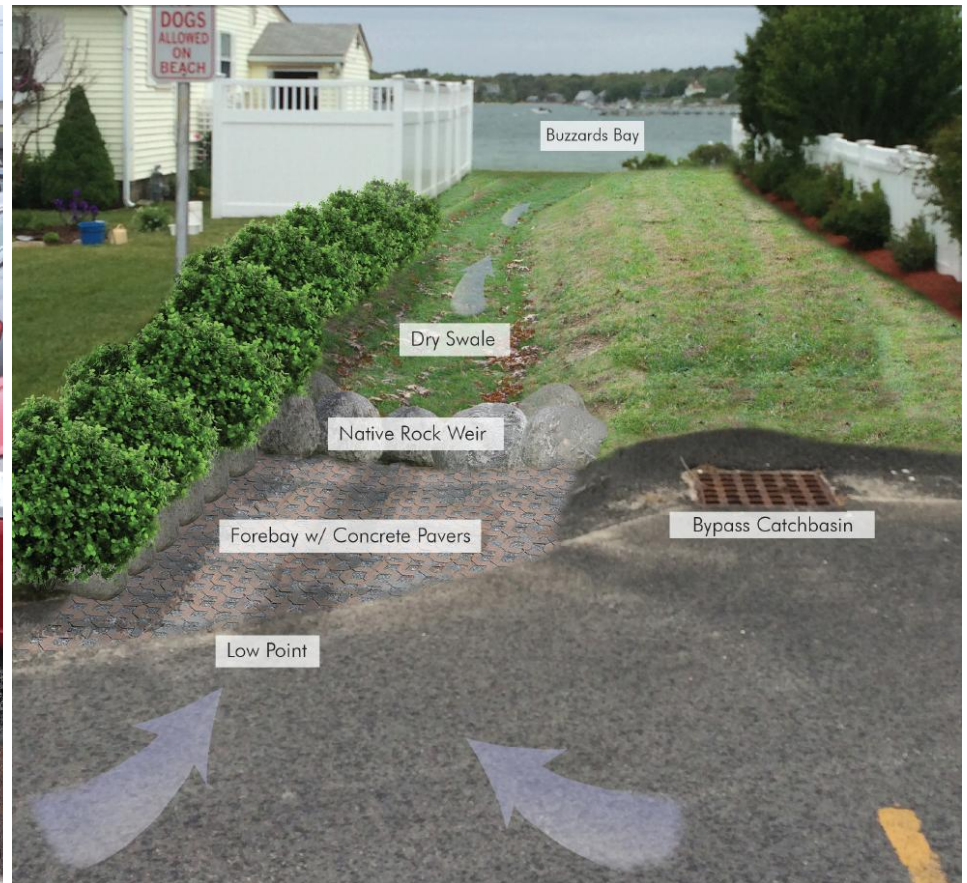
Site 32B Modified Design Using a Dry Swale
